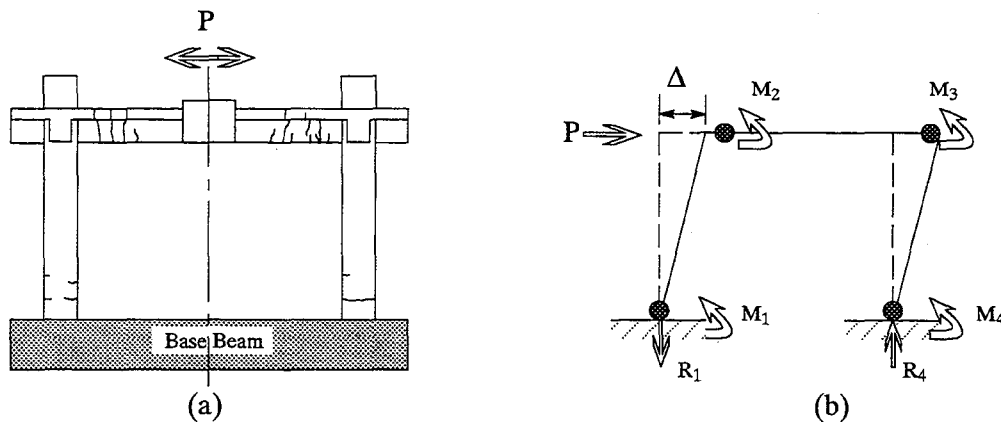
Cracking of Reinforced Concrete Frame
